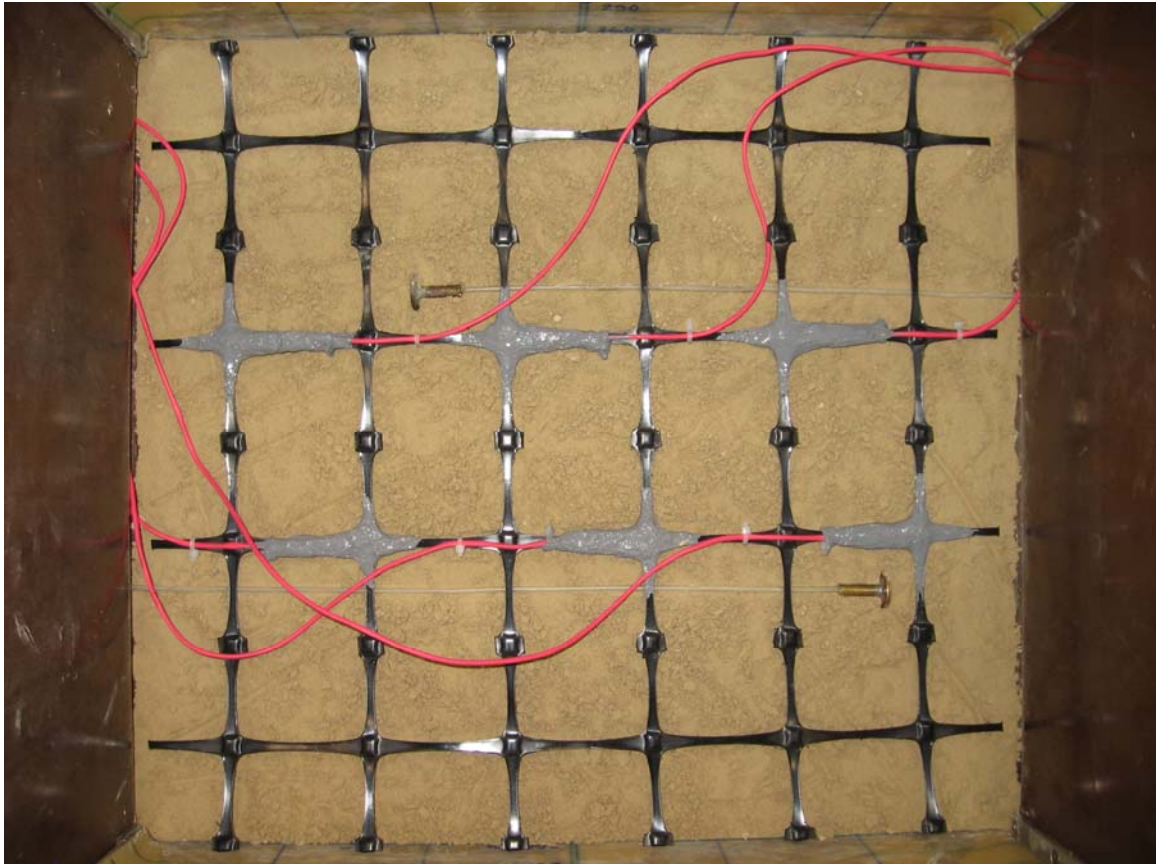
Photograph of geogrid reinforcement laid-out in the silt specimen
